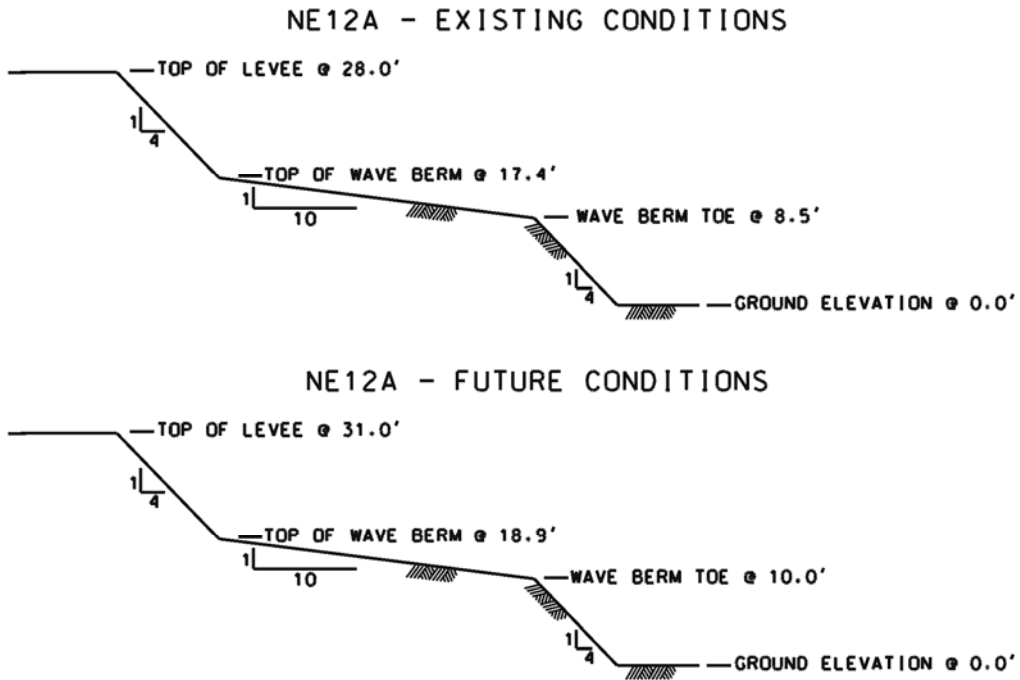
Typical Levee Design Cross-Section – New Orleans East Back Levee (NE12A) for existing (upper panel) and future conditions (lower panel).
